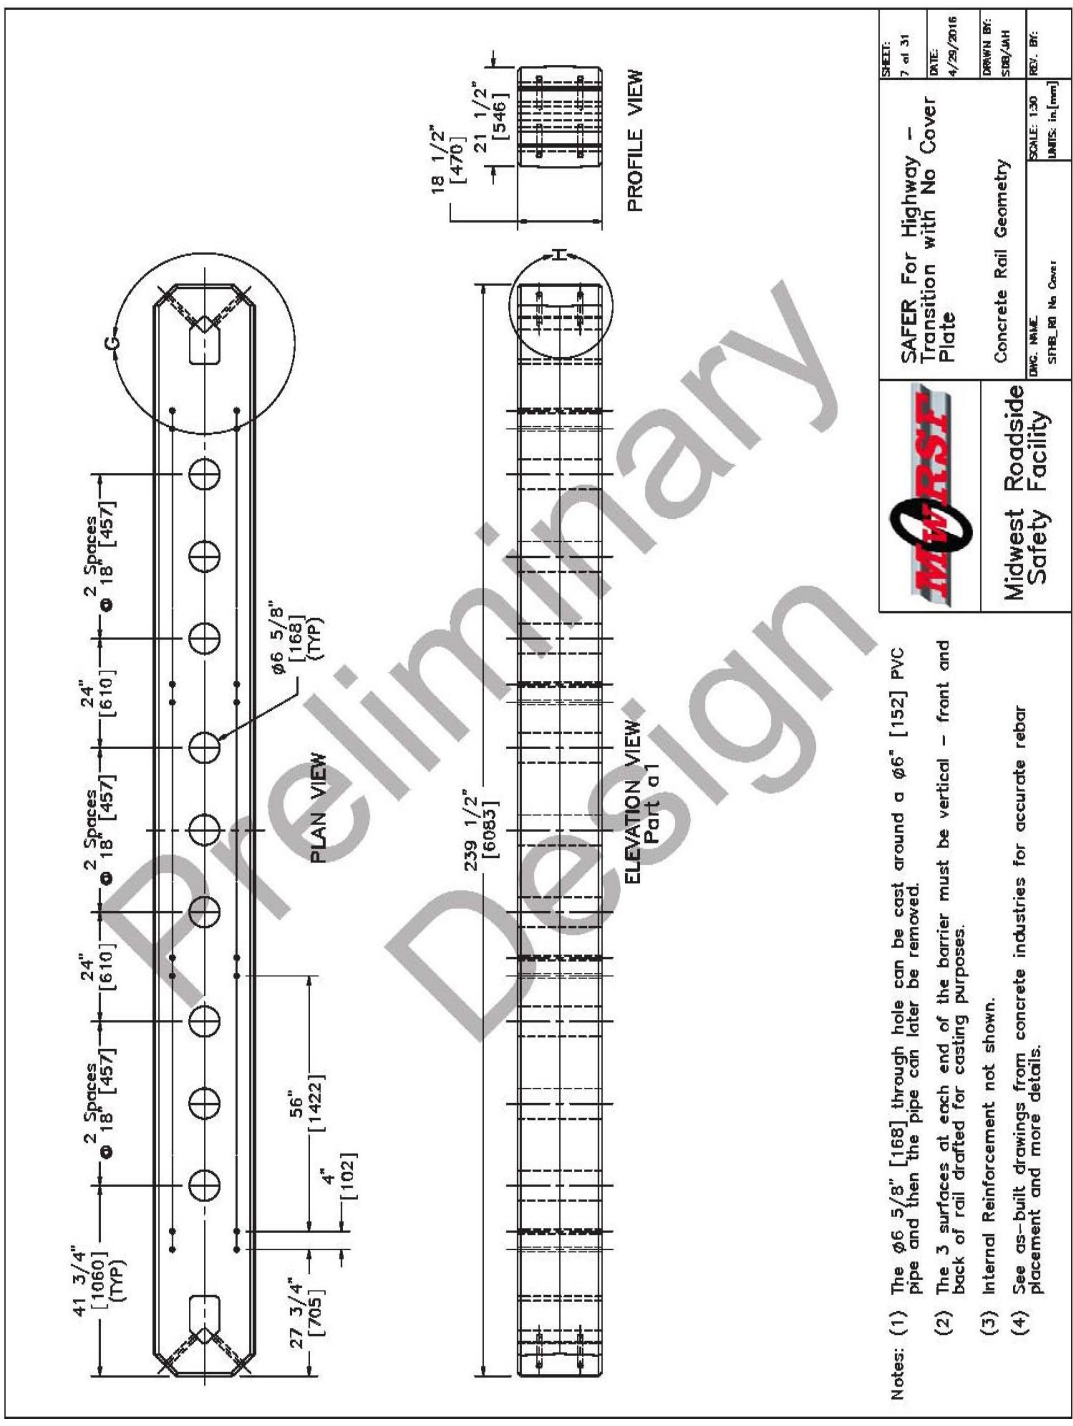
Concrete Rail Geometry, No Cover Plate, RESTORE Barrier Transition
